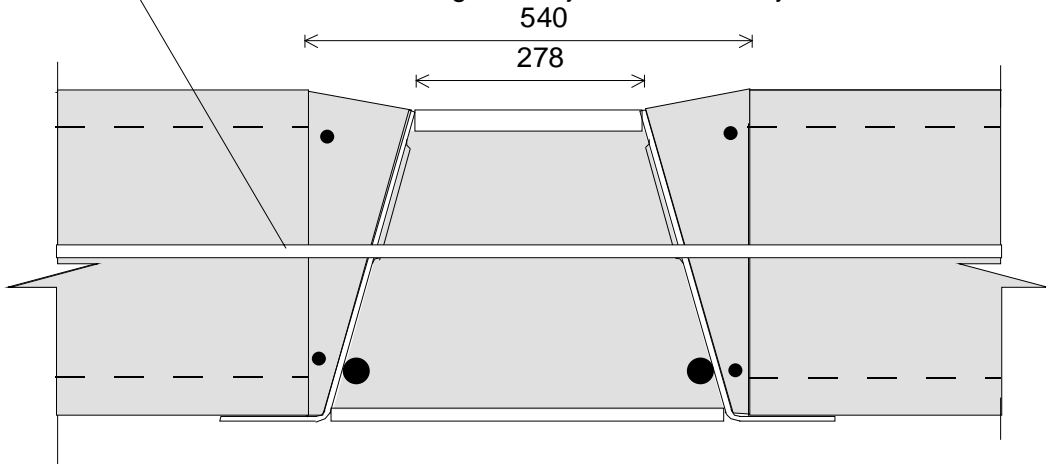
Section along joint between adjacent slab units, see Fig. 2.
